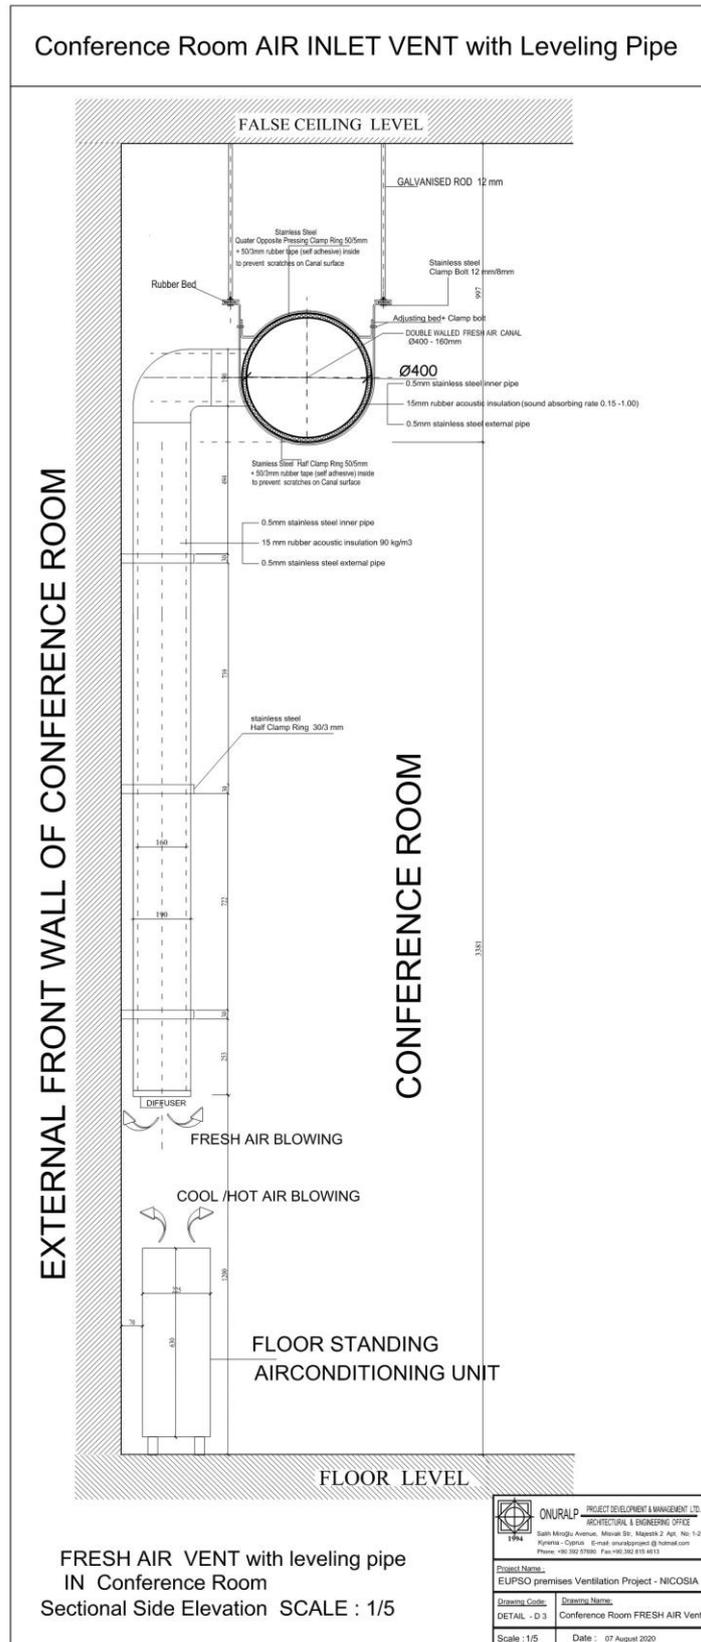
Fresh Air Leveling pipe with Vent in Conference Room – EUPSO project detail no:1
